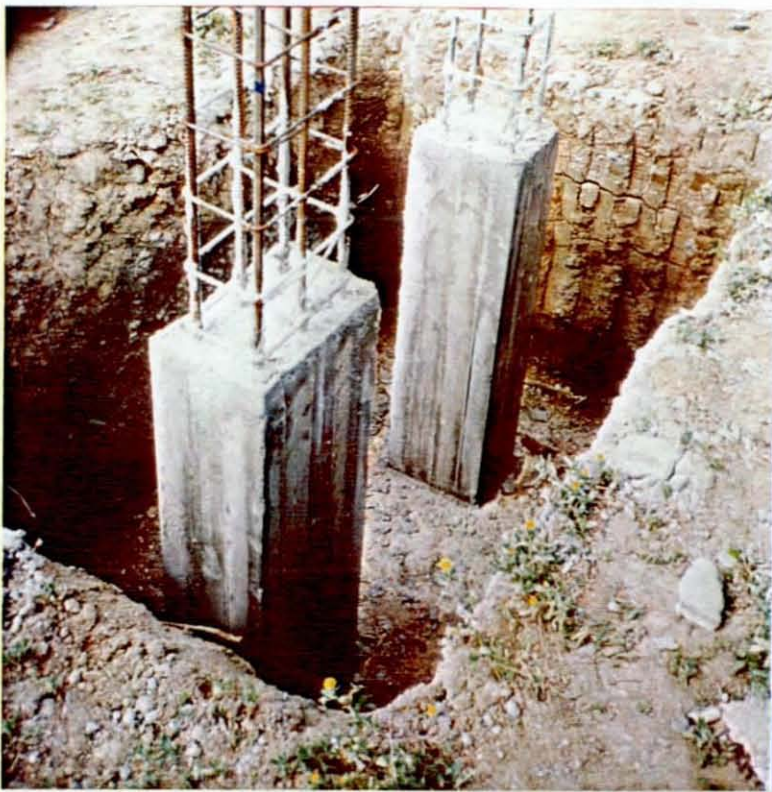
(a) . Columns filled with concrete up to the surface of the ground.
